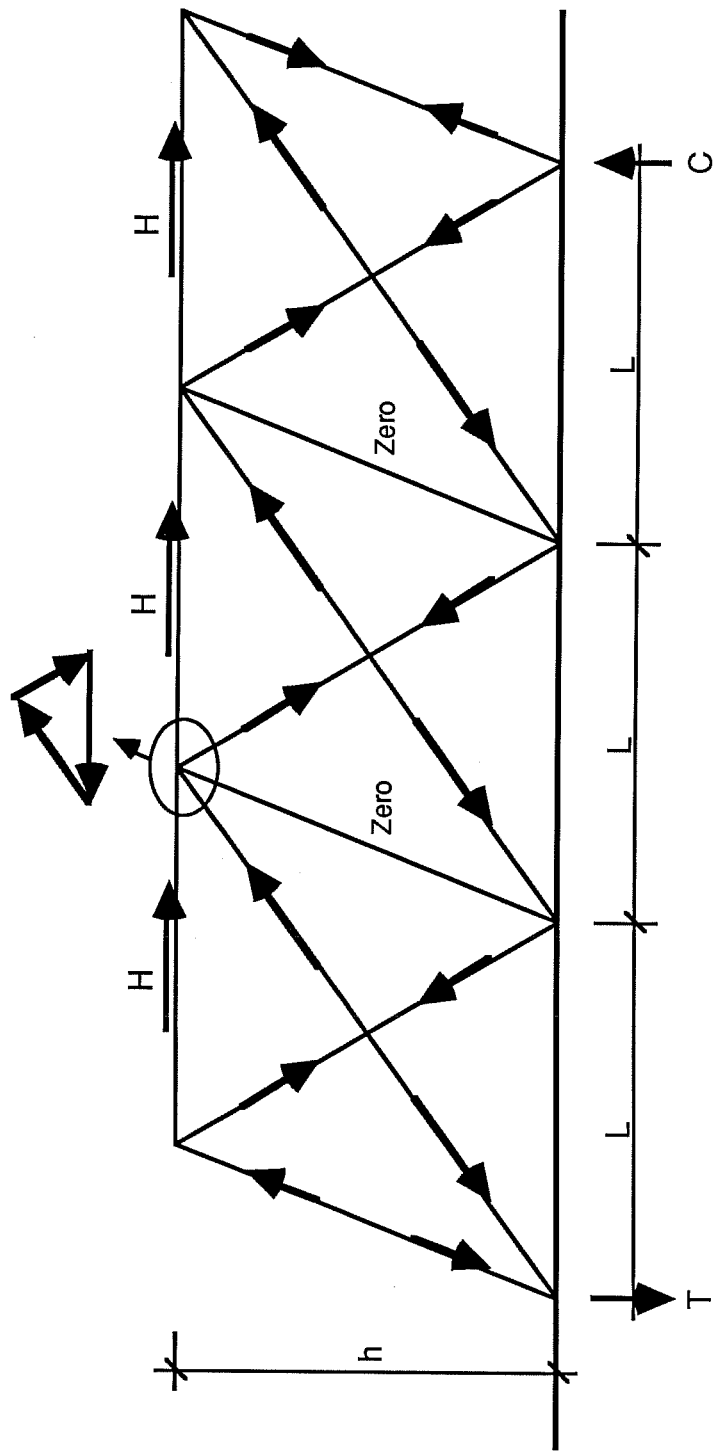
Forces in a bracing system with X-pattern
